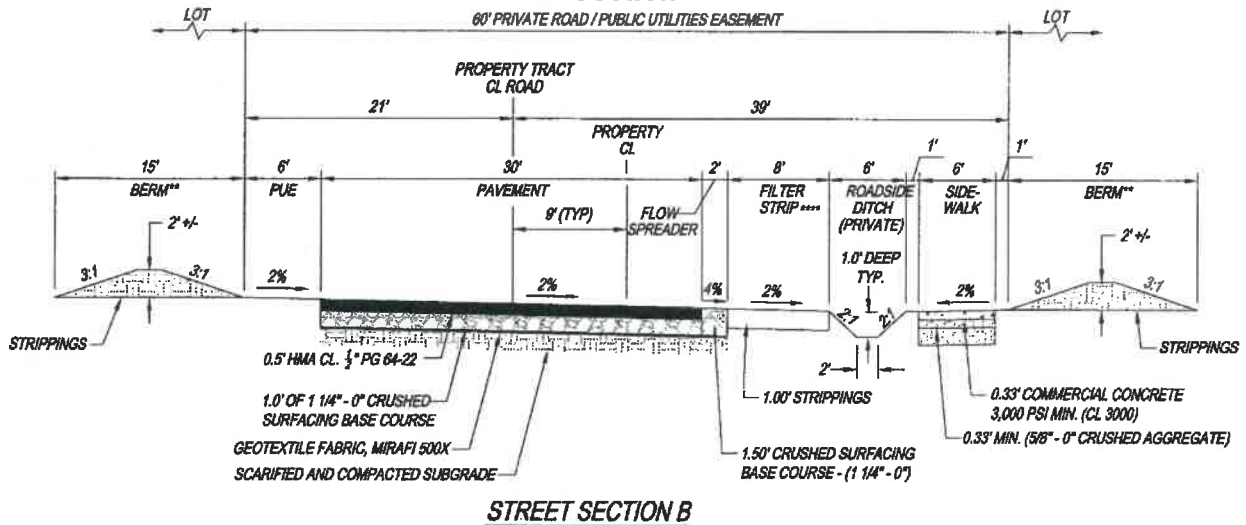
Street Section B: Water Quality Filter Strip with Private Road Section
